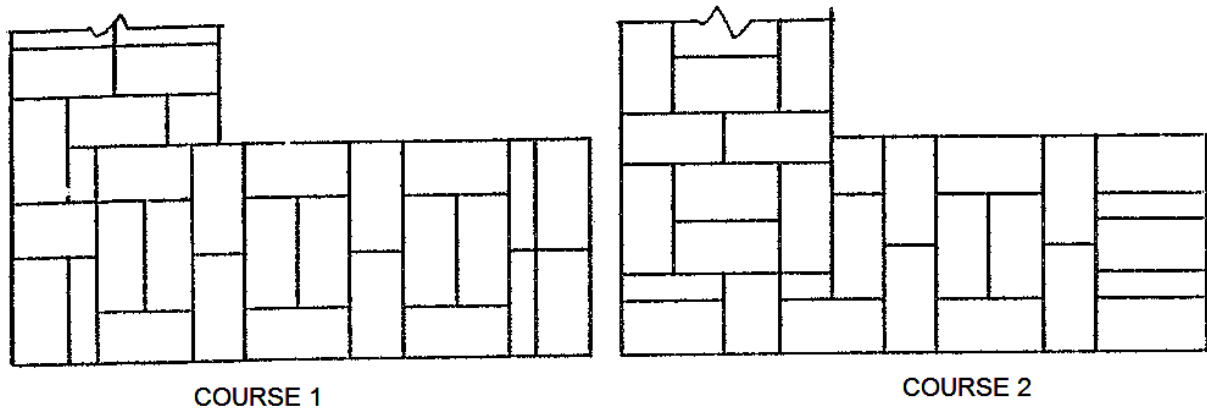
Alternate plan course of a quoin in two-brick walling
